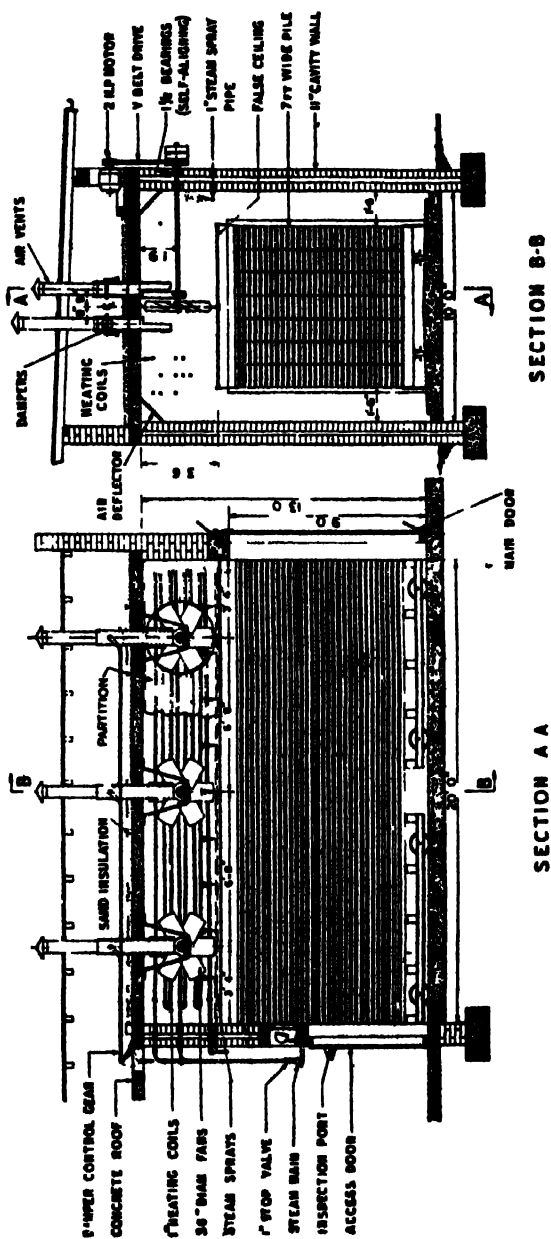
Longitudinal and sectional views of angle-stack, cross shaft overhead fan kiln
